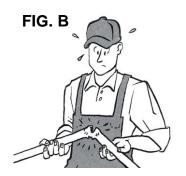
FIG. B: Damaged components must not be used for the assembly of mobile working towers.
